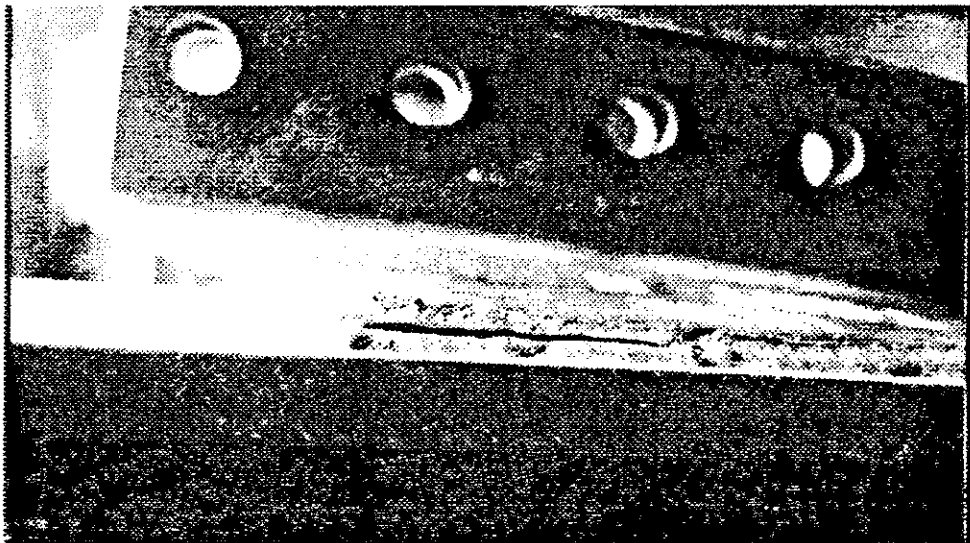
Fracturing of Weld in Double-Angle Connection
